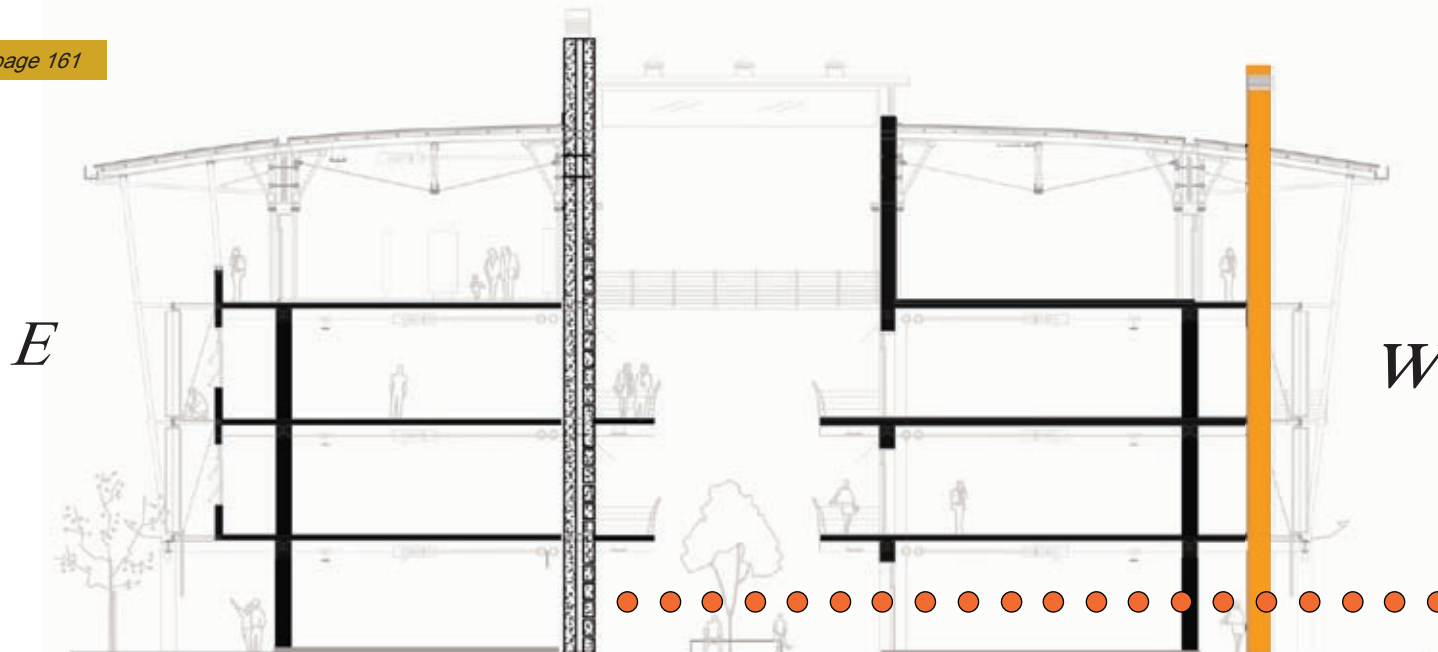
Northern Elevation showing structural system and ventilation stacks on western facade
